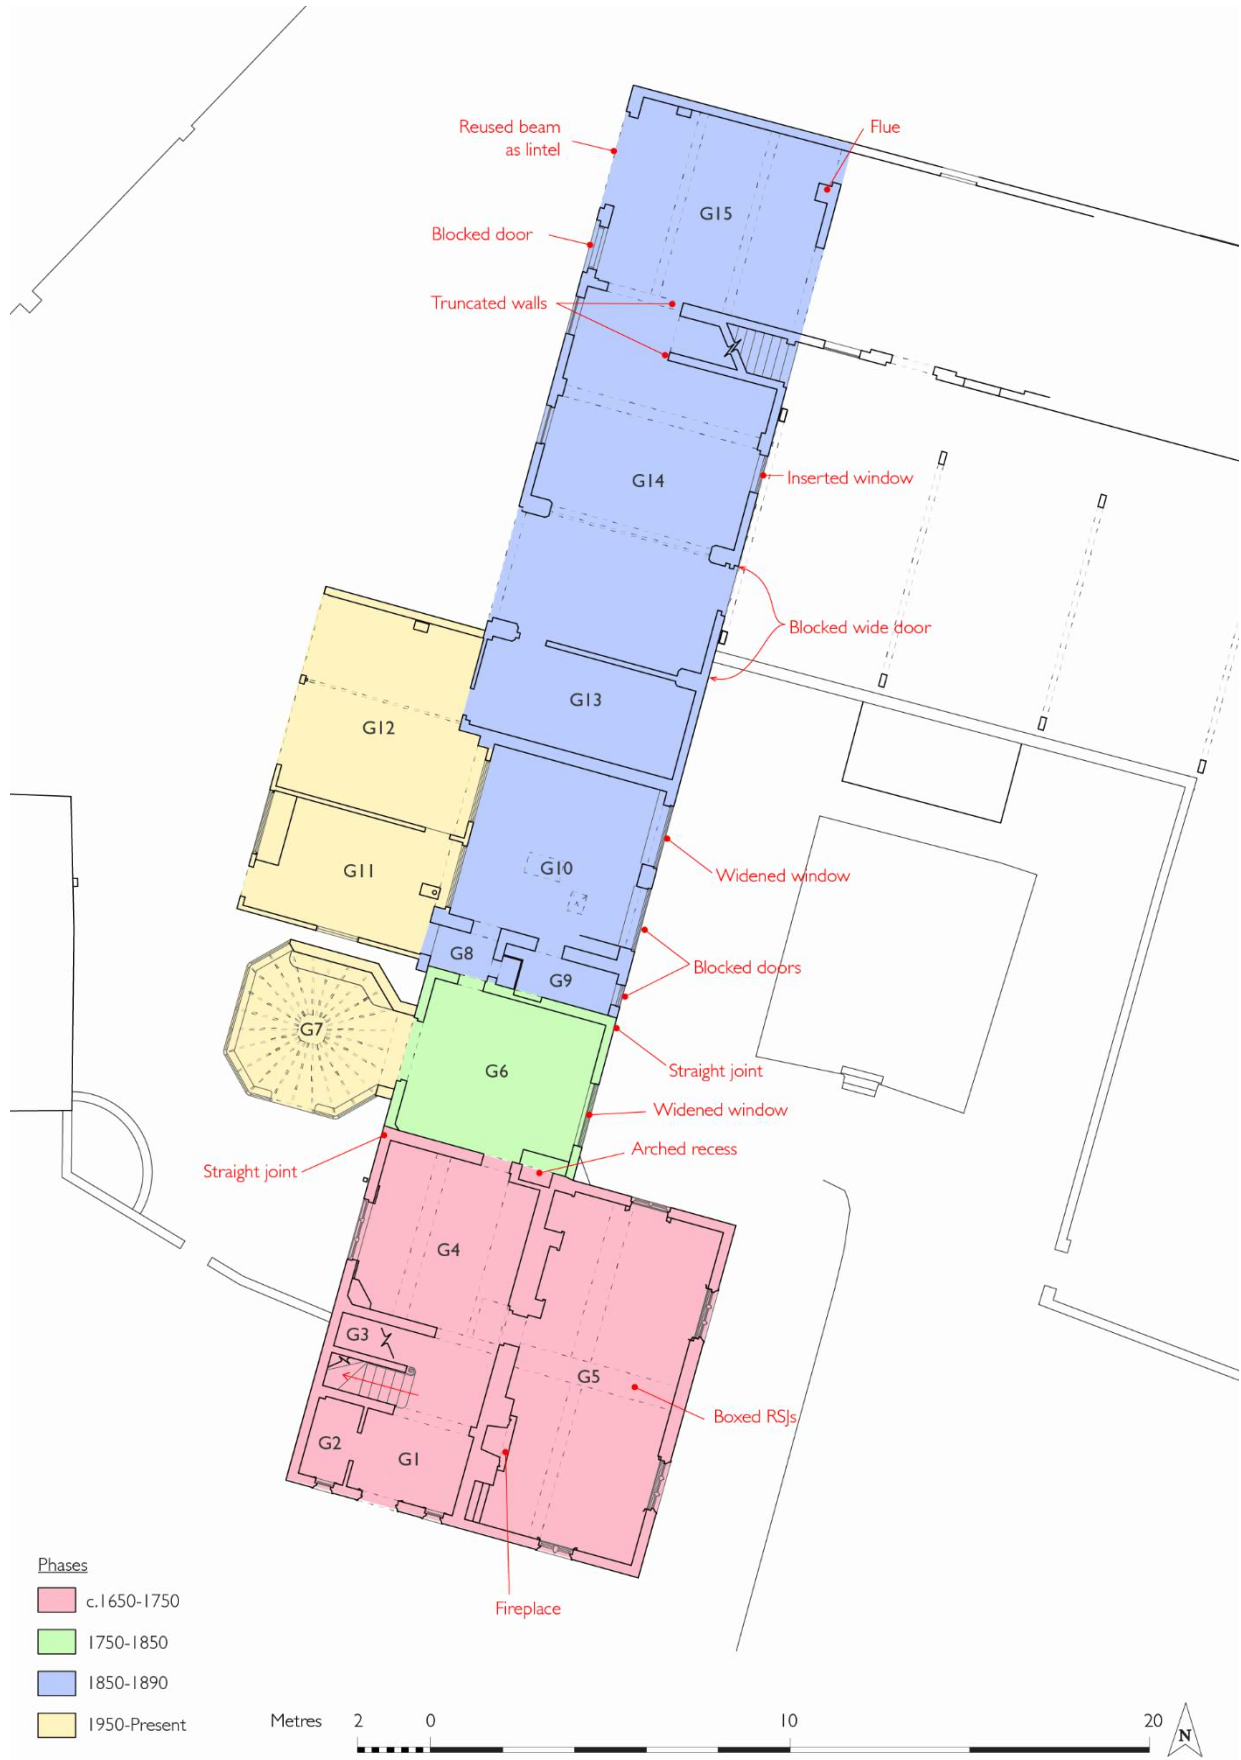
Ground floor plan with block phasing (Buildings 1-4)
